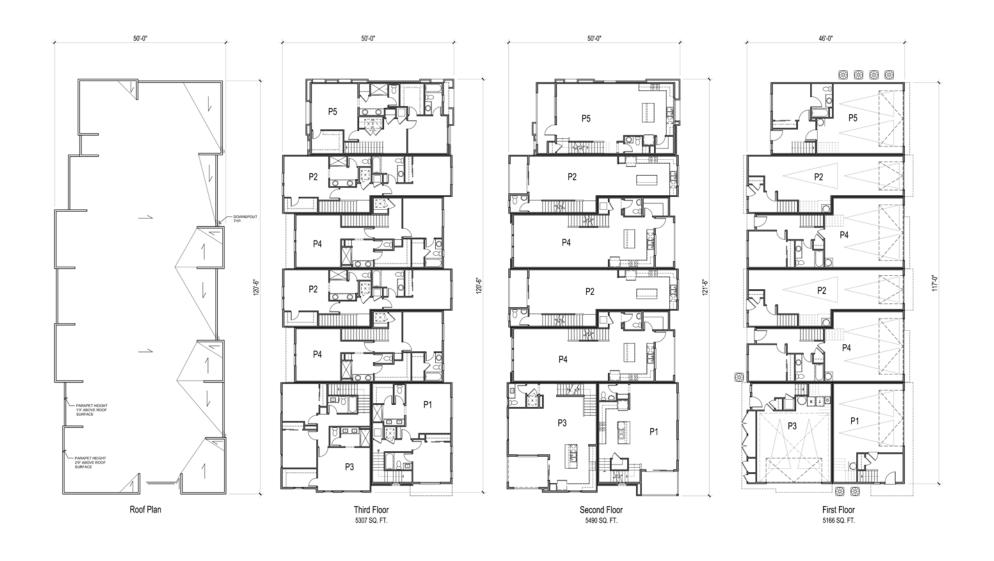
Conceptual Architecture - 7-Plex Building Floor Plan "B"
